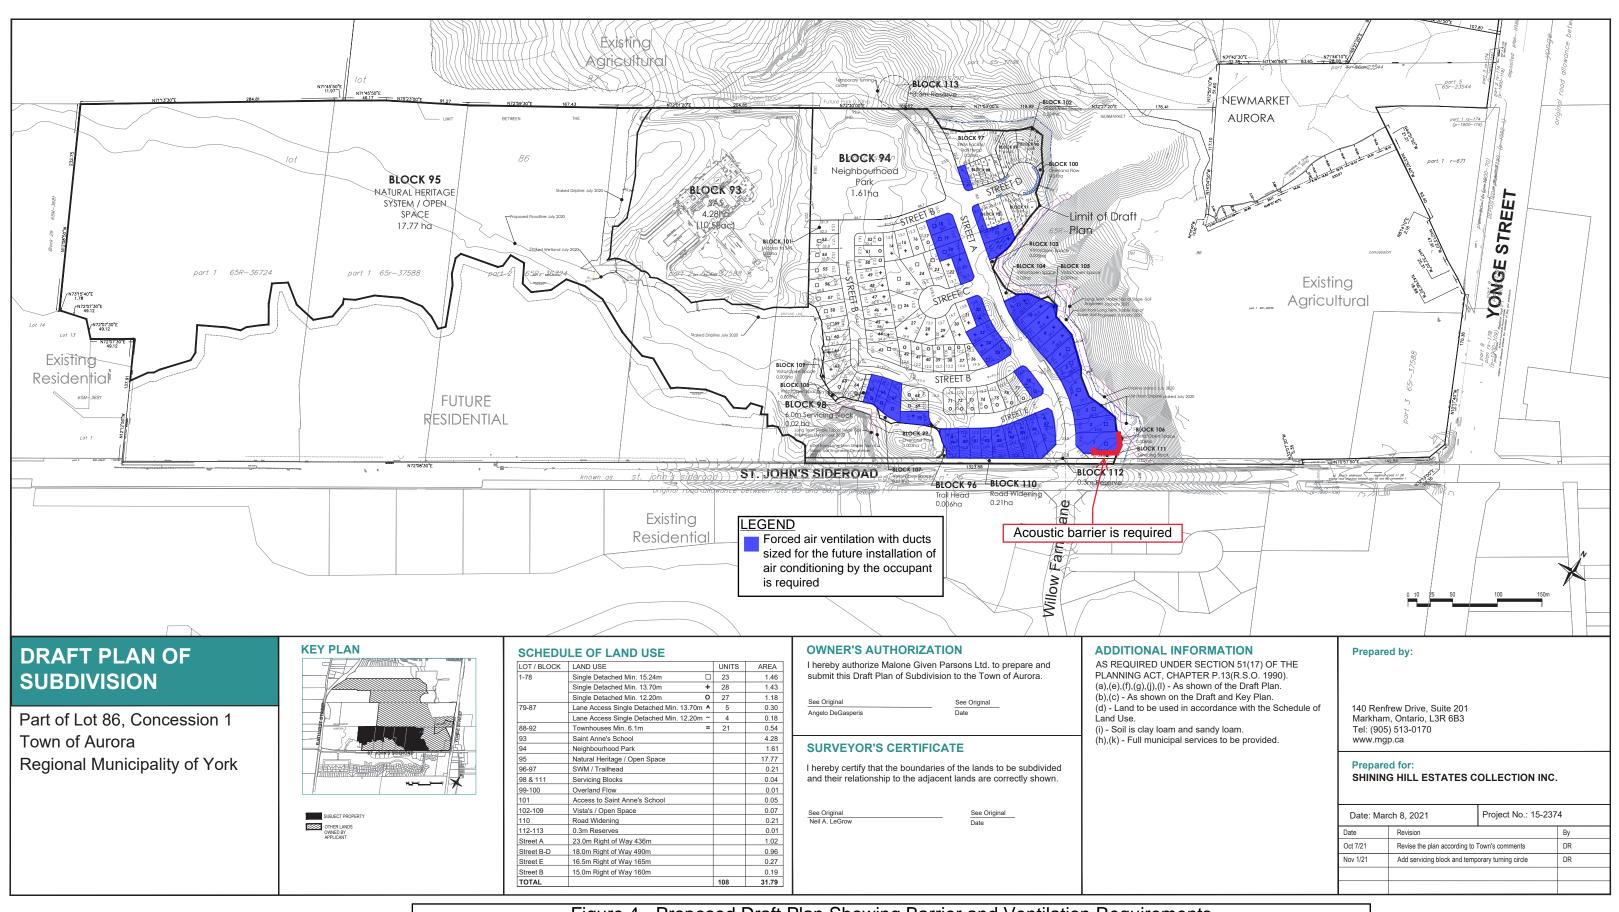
Proposed Draft Plan Showing Barrier and Ventilation Requirements
